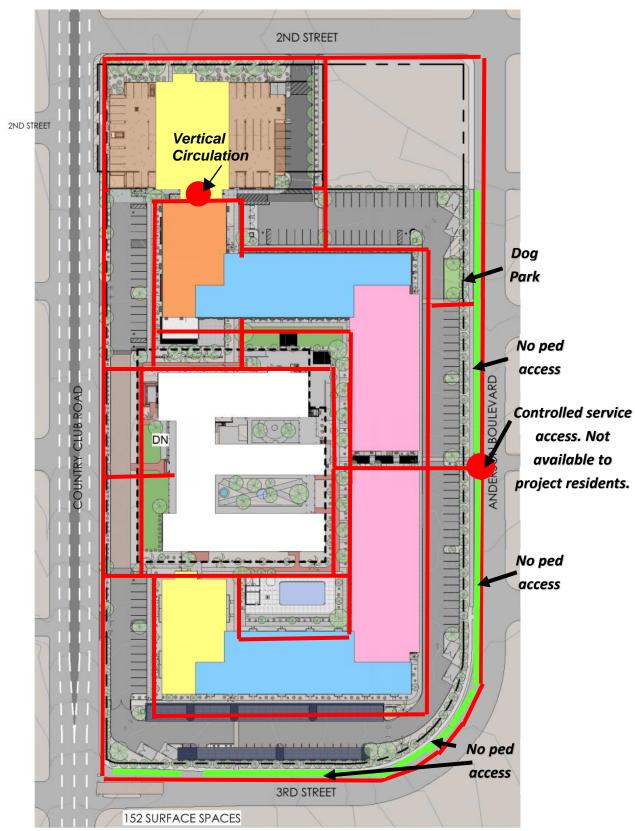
E PROPOSED PEDESTRIAN CONCEPT (Sidewalks minimum of 5', 6' on CC)
